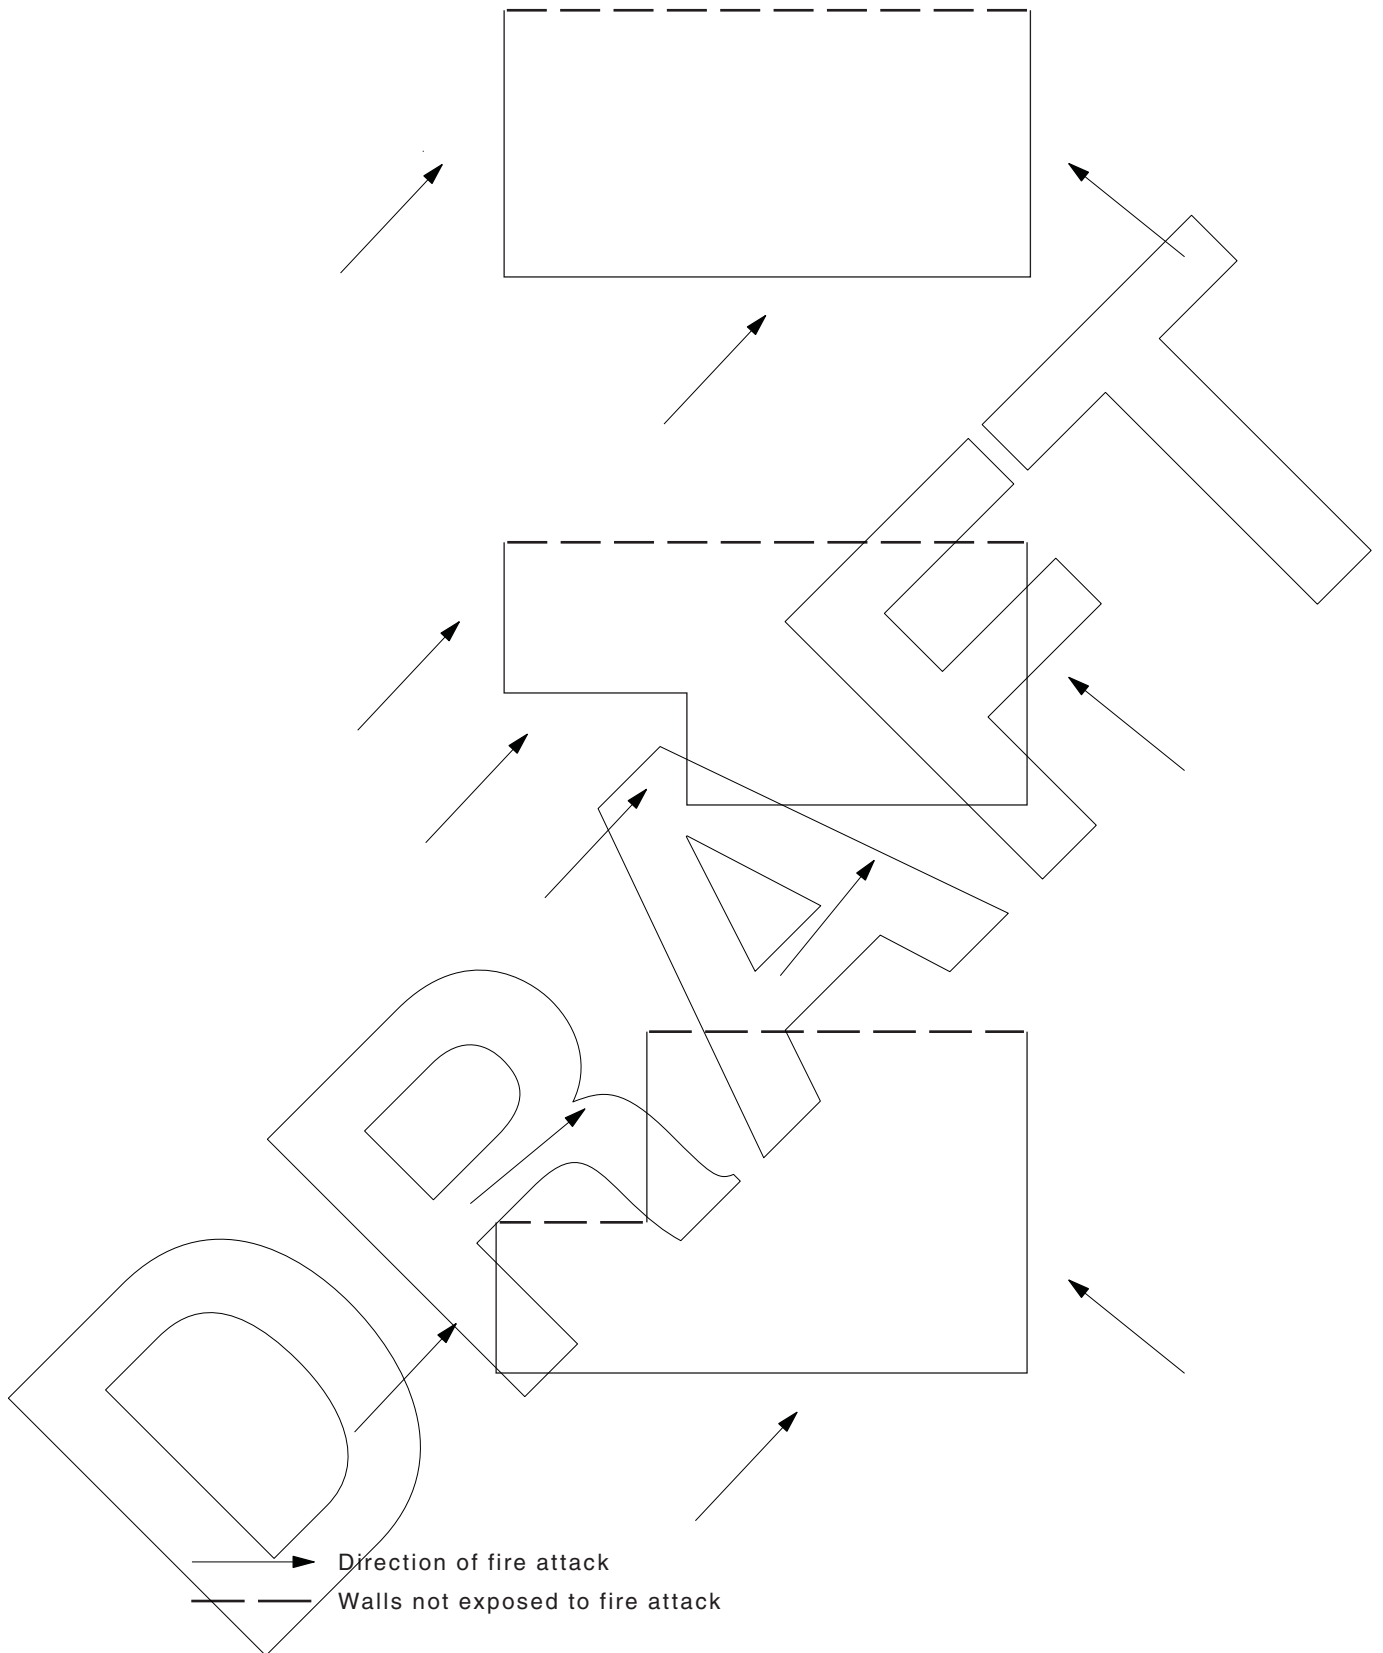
EXAMPLES OF WALLS SUBJECT TO SHIELDING
